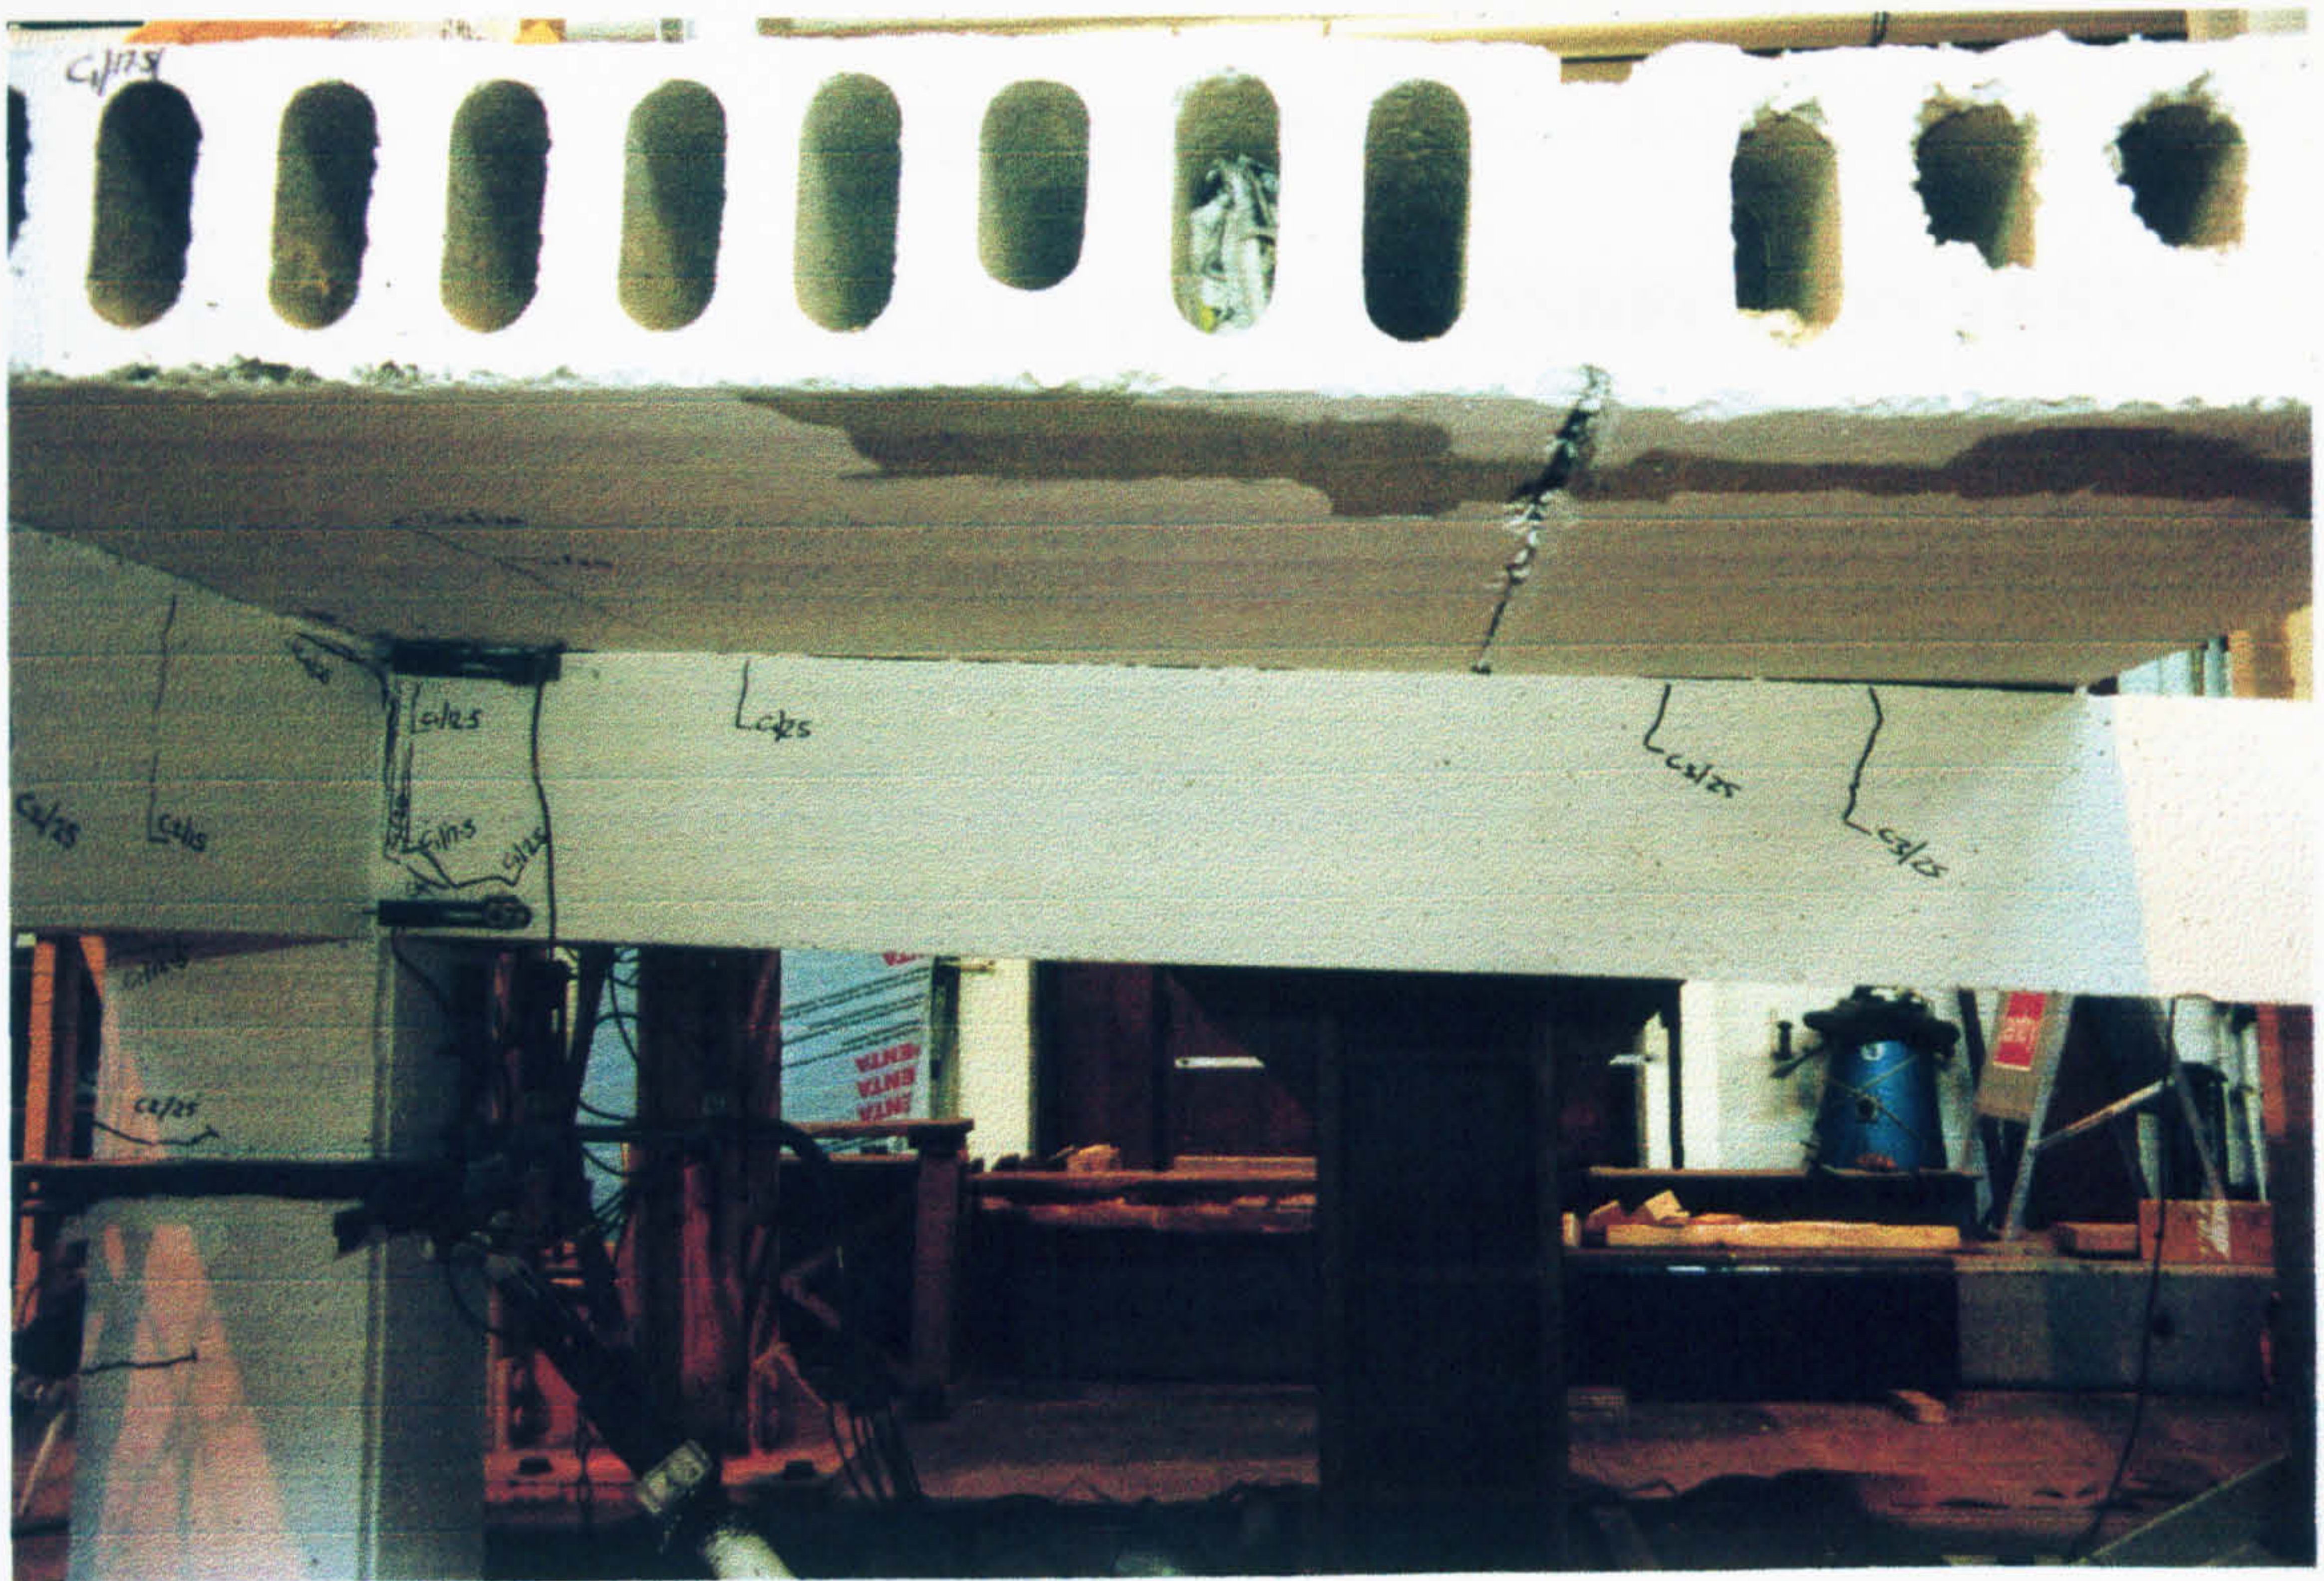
Damaged profile of the precast members from East in TB2
